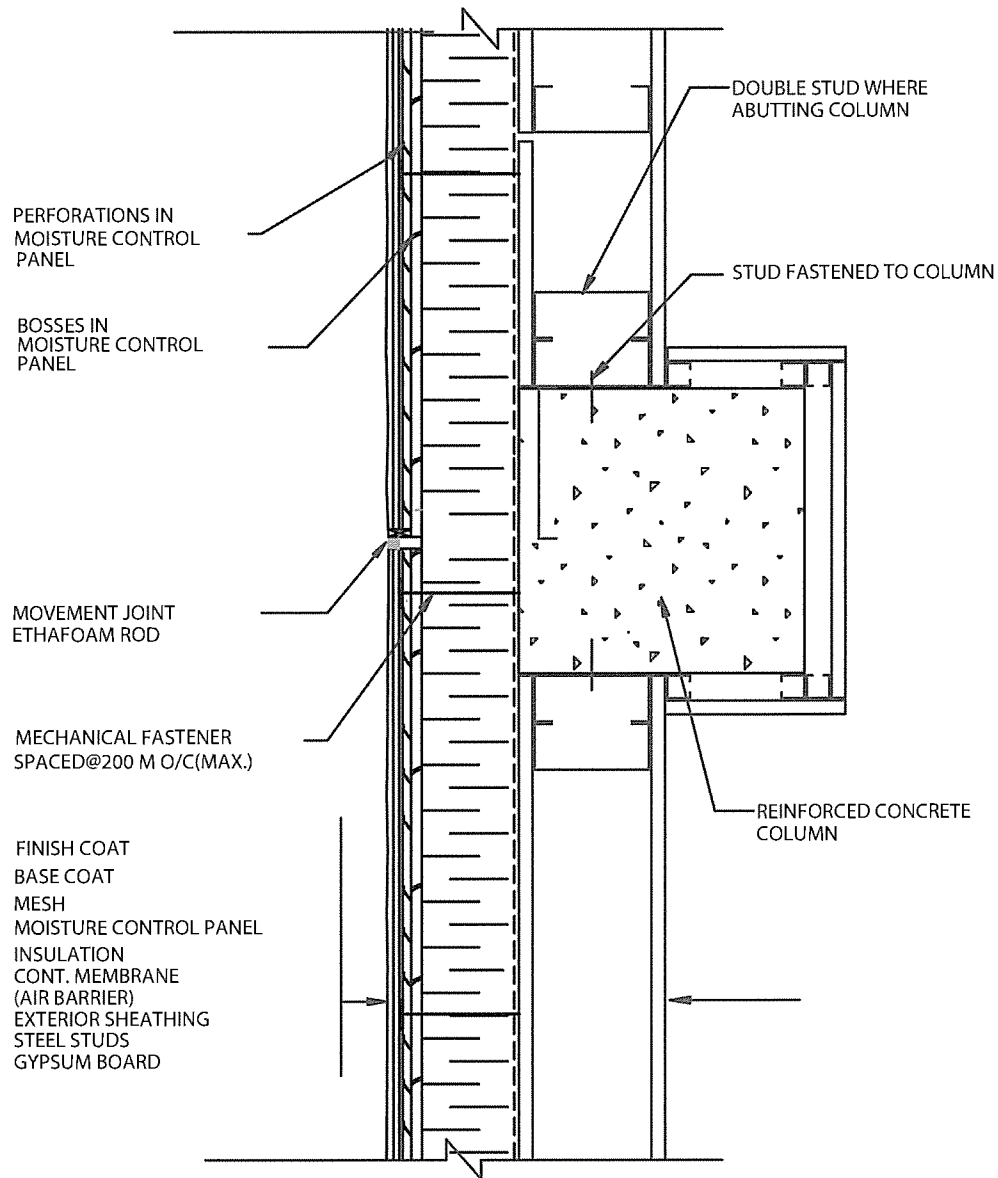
ACRYLIC STUCCO/STEEL STUD
